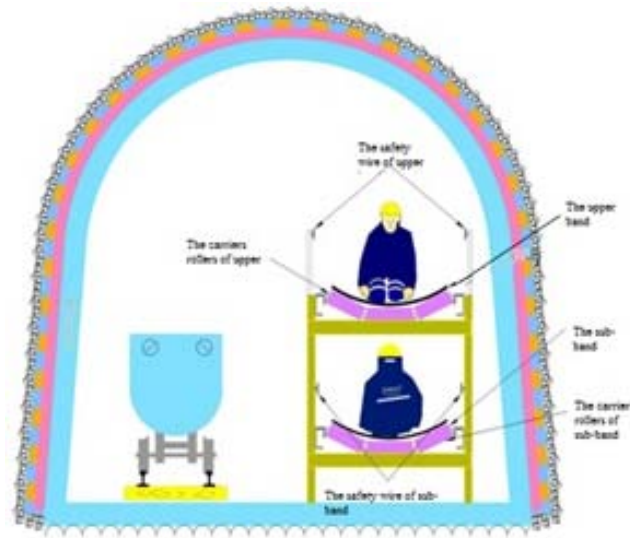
A. Cross – section of belt conveyor (Concrete support).
